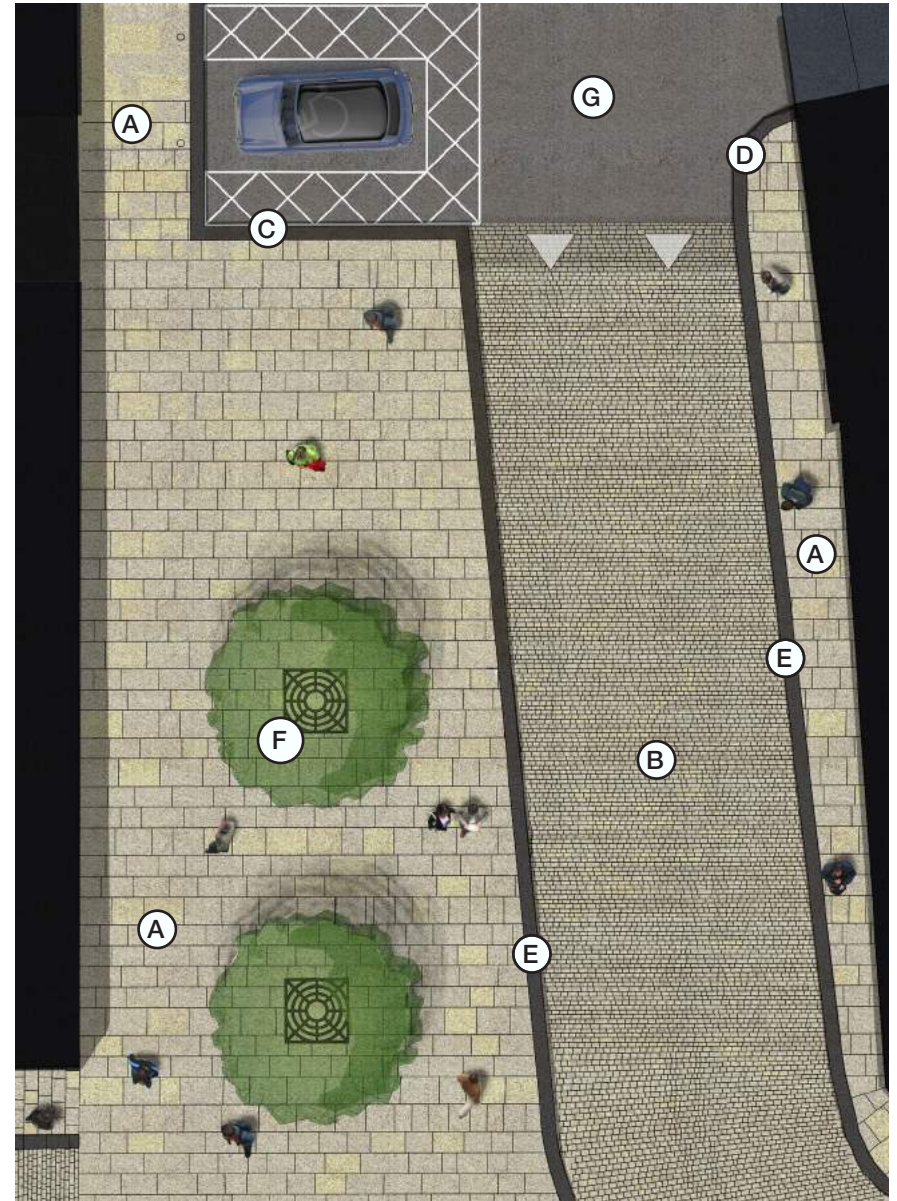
Concept sketch plan illustrating typical layout and materials of the street (Example Bull Plain)
